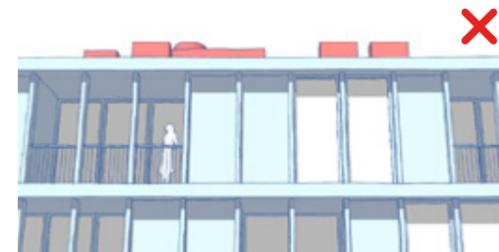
Plant and services on roof. Seeing plant equipment from street level can have a negative impact on the character of the street.
